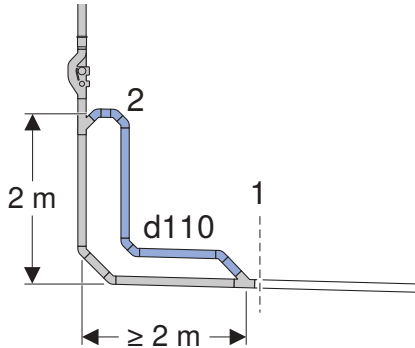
Transition of a stack with Geberit HDPE Sovent fittings d160 to the collector pipe
